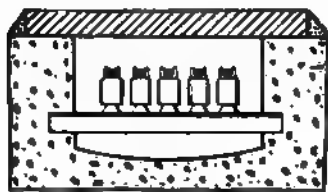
Section of culvert with strained copper showing supporting bar.
